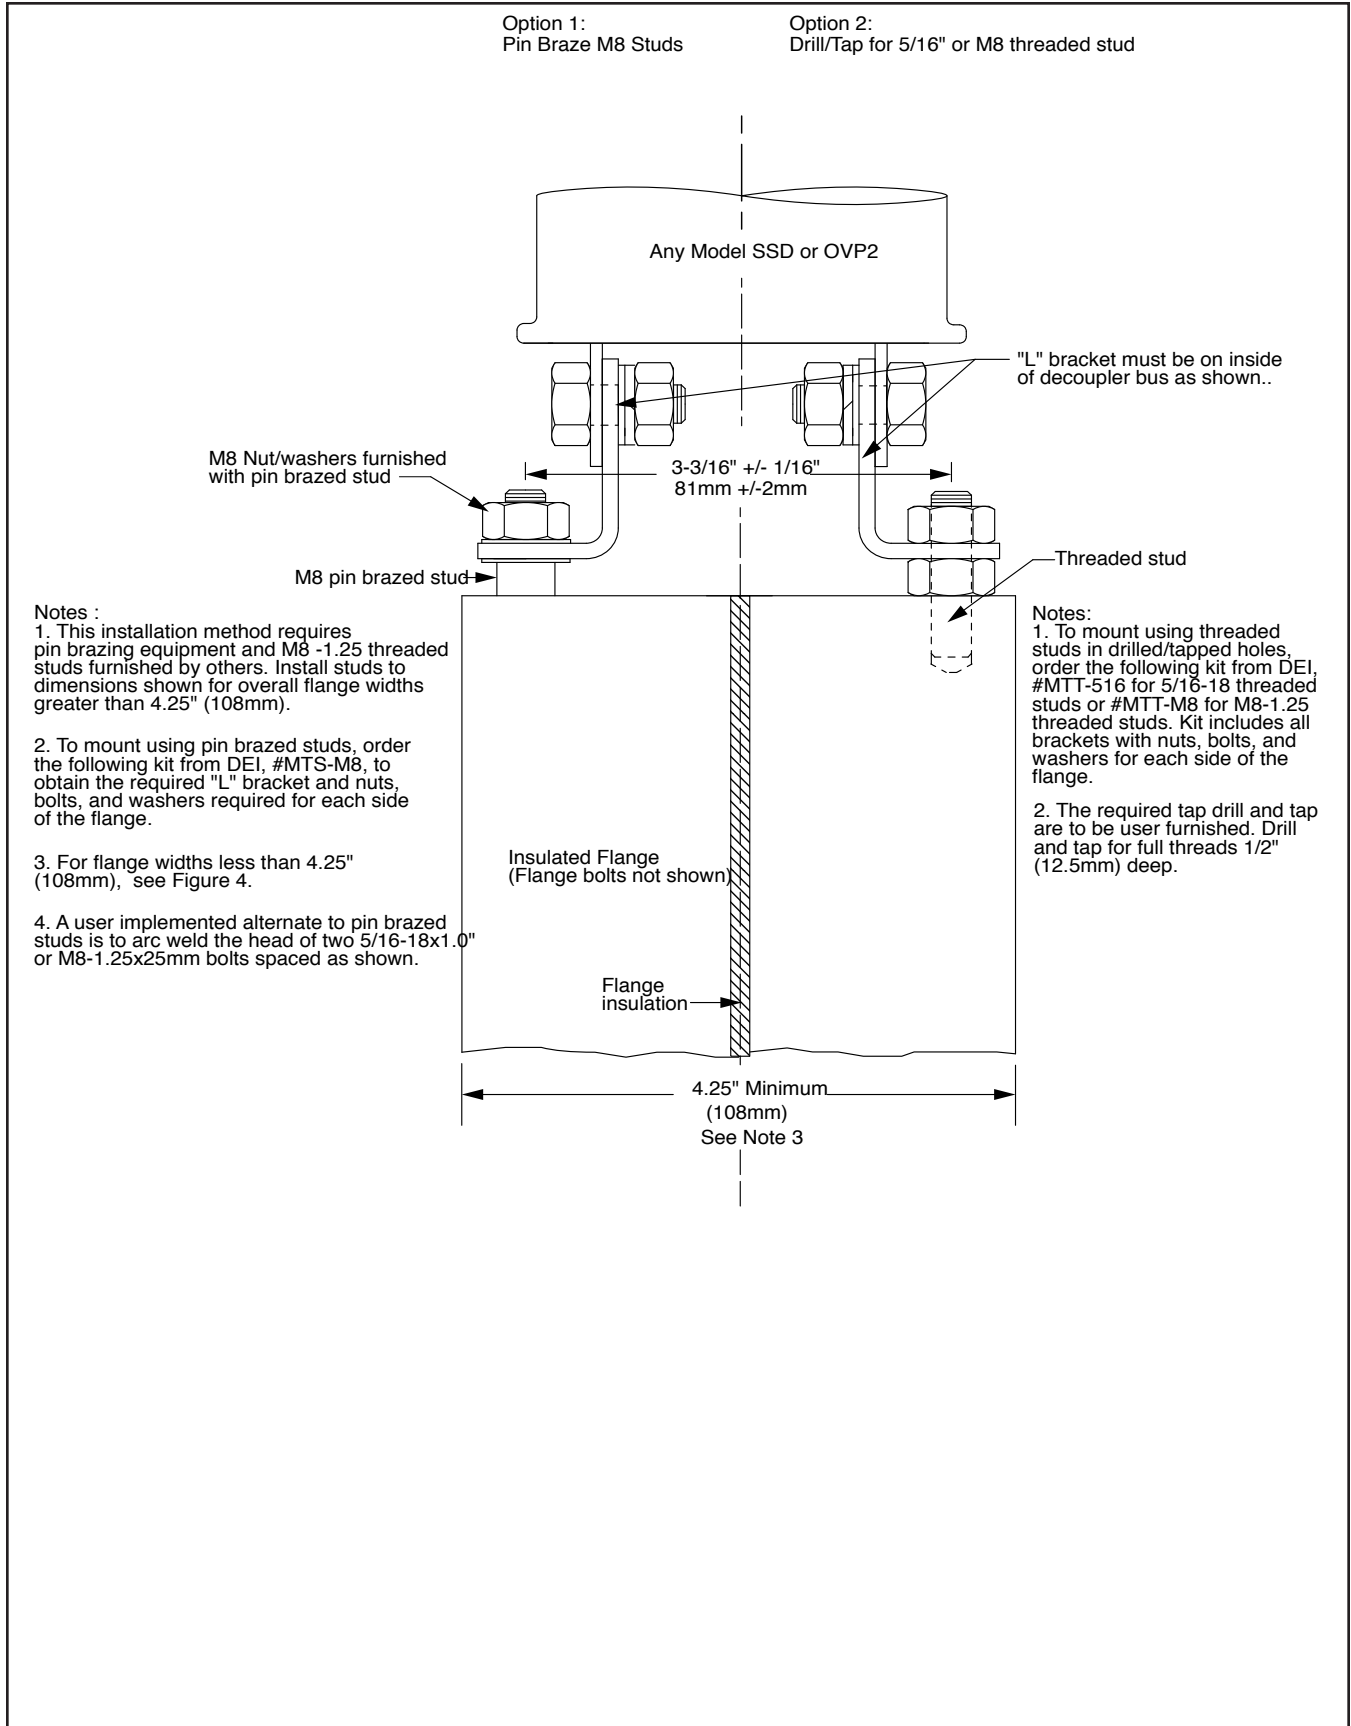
Pin Brazed Stud Connection to a Pipe Wall
